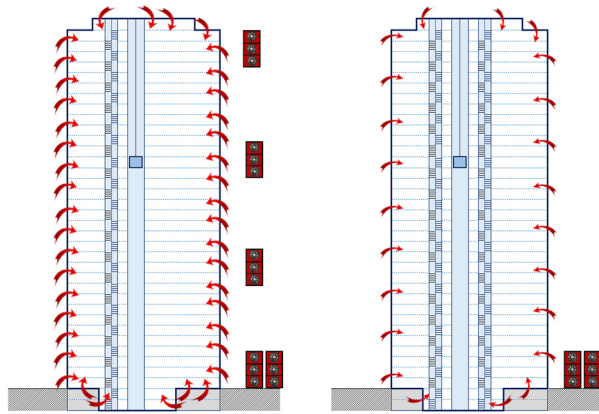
Left: Building with high air permeability and small airflow paths - BlowerDoor fans are located throughout the height of the building. Right: Building with low air permeability and wide airflow paths - BlowerDoor fans placed on the ground floor
